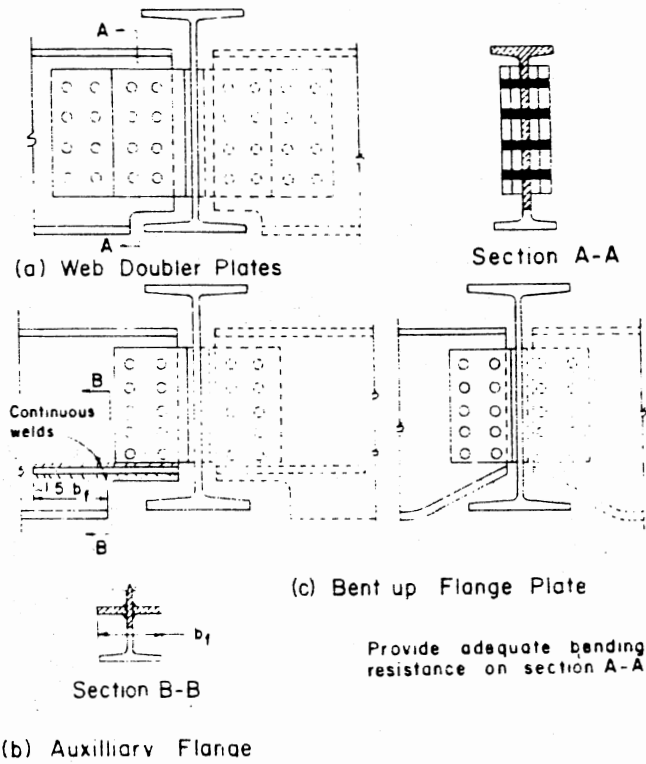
Recommended Connections Where Stringer Flanges Must Clear Floor Beams (5)
